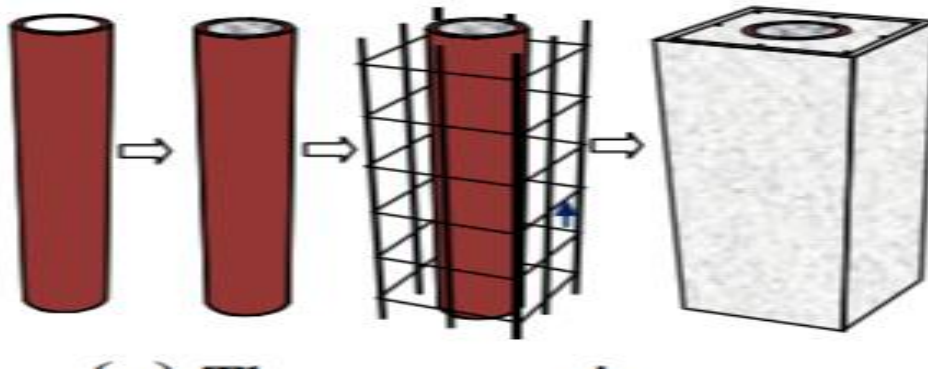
construction sequence of concrete filled encased column (source: Han and An 2014)
